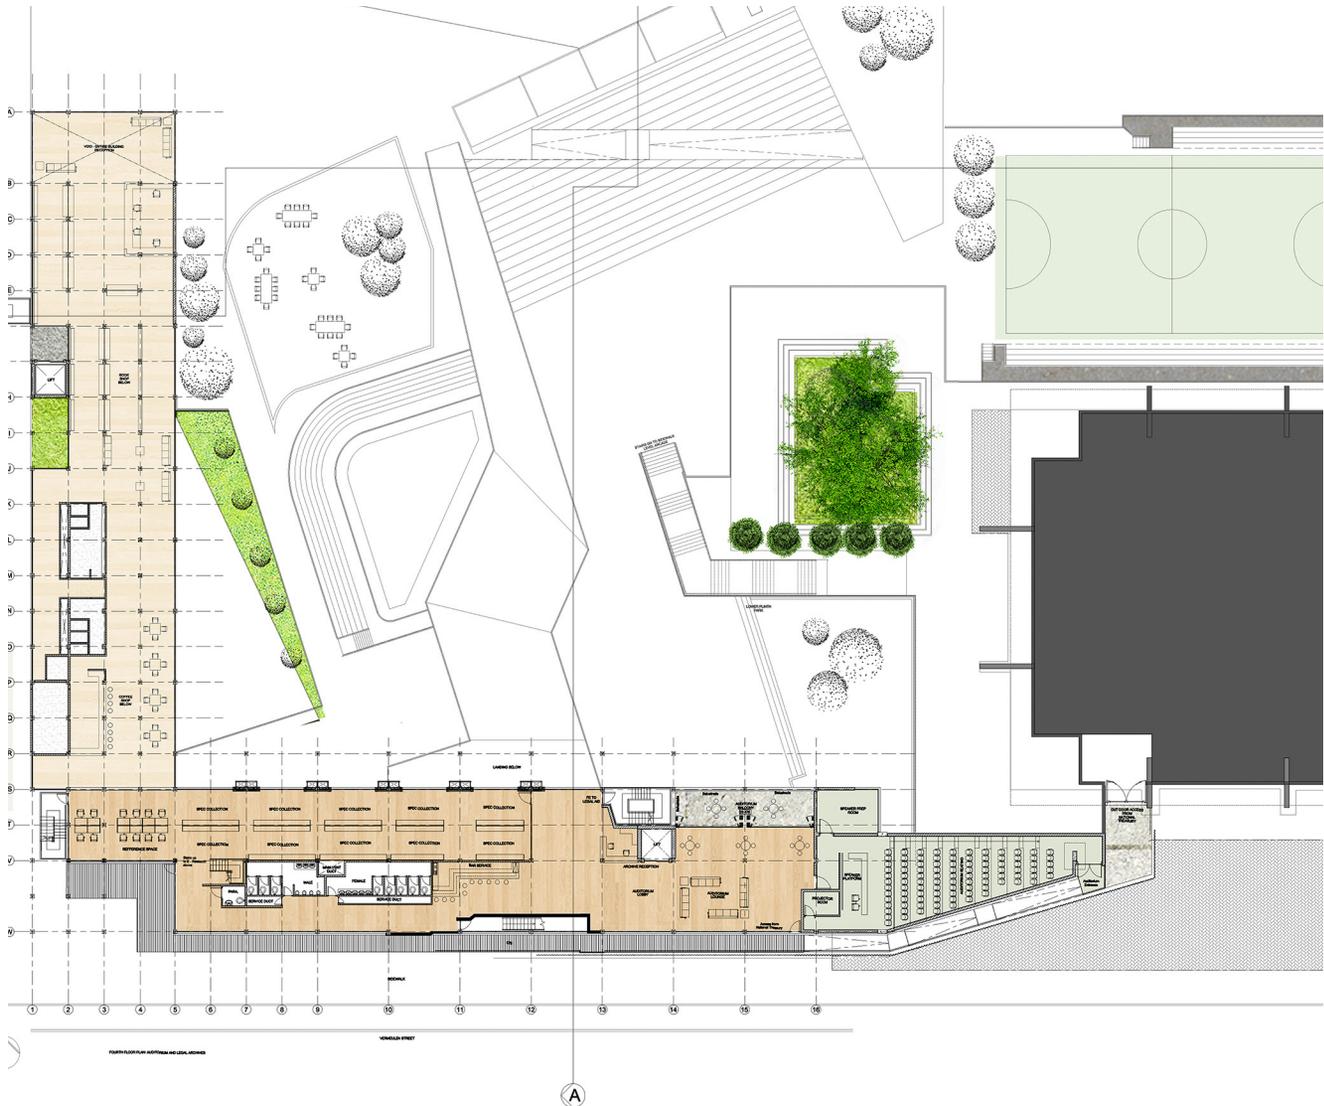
3rd Floor Plan: Home Affairs and Public Library (Author 2015)
